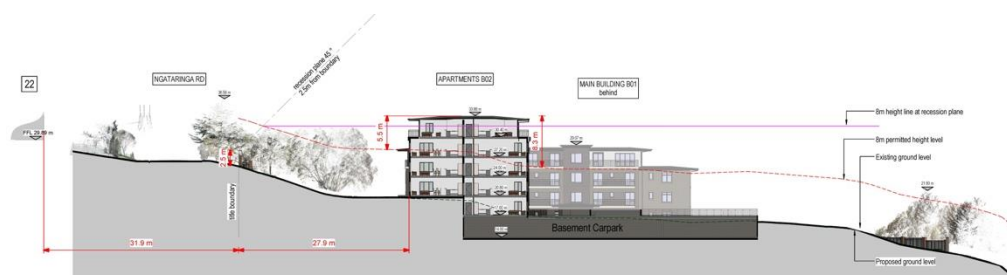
Building B01 Section C, opposite 12 Ngataranga Road ((Ryman Drawing A3-020 RC11).
